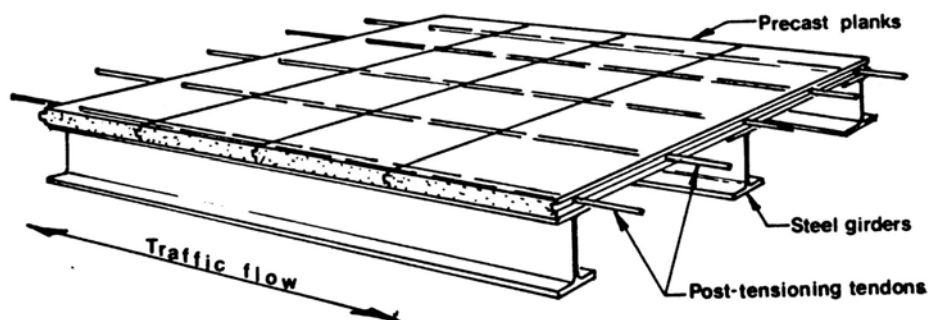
Schematic of Purdue test bridges (Ref 9)
